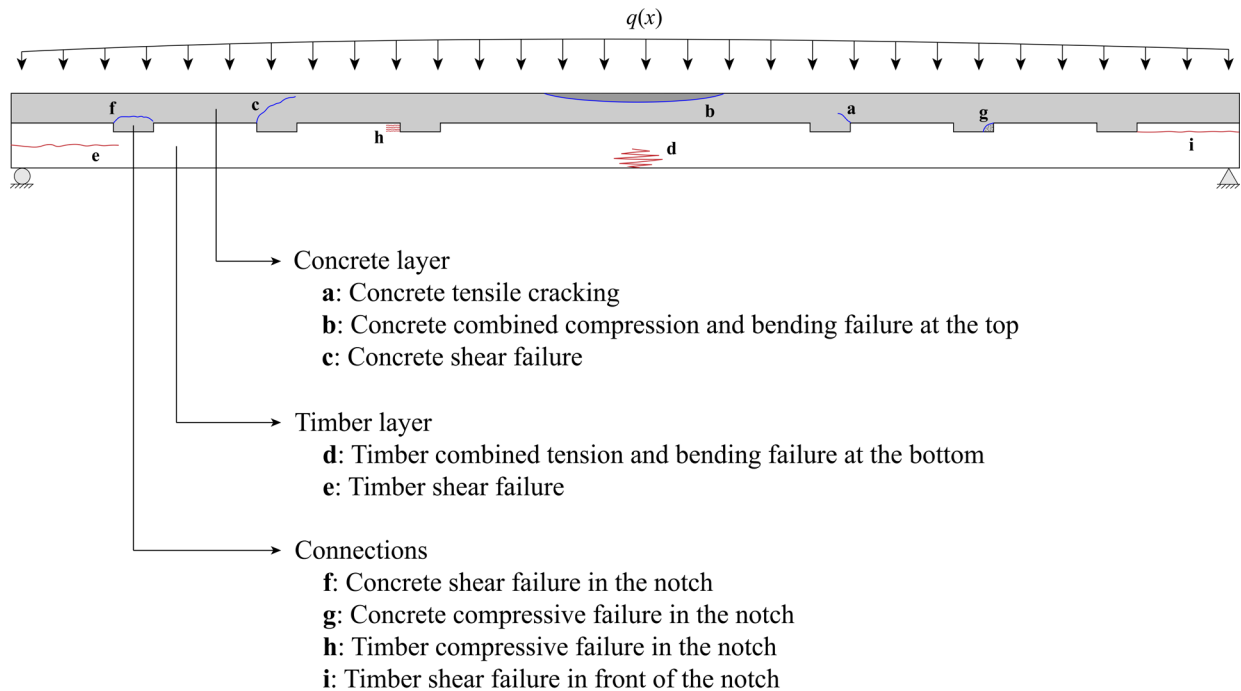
Possible failure patterns and damages of MTP-concrete composite floors with notches under bending
